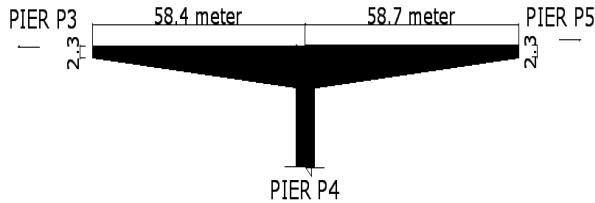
Elevation of pre-stressed balanced cantilever box girder P-4
